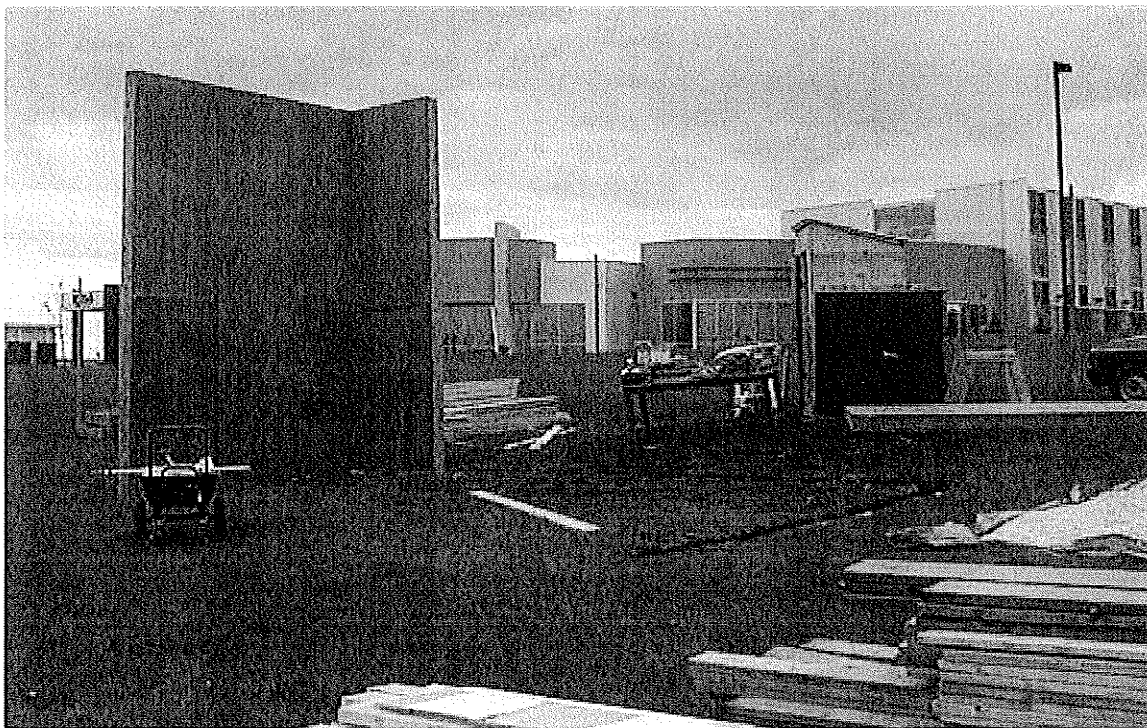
Initial four Wall Panels erected and placed in Trench (view to the North West).
